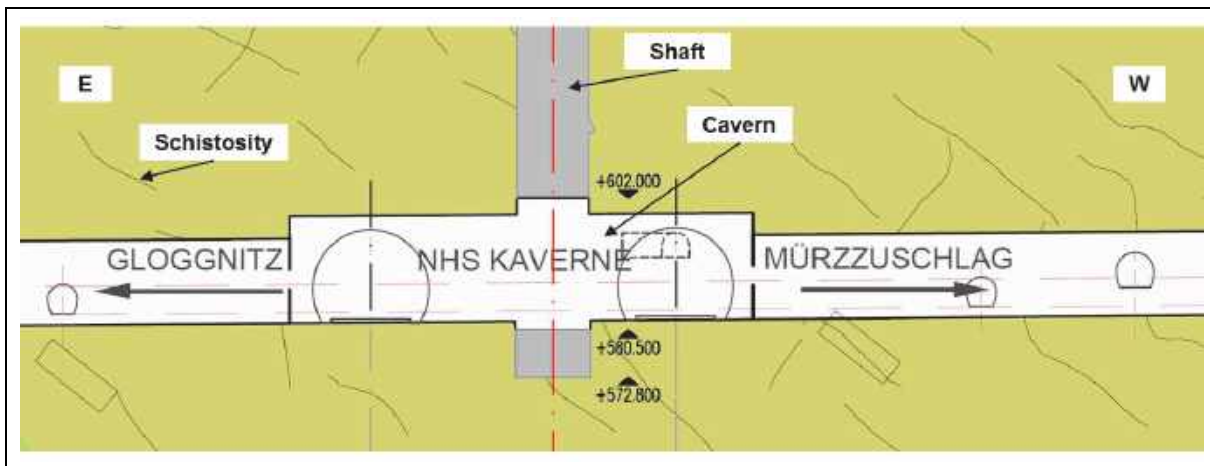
Layout of shafts and caverns at the Semmering Base Tunnel
